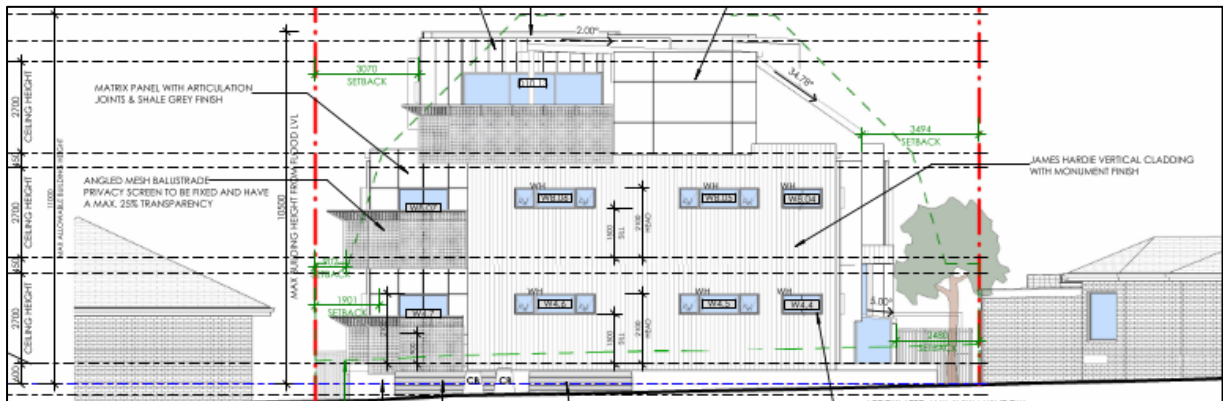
(Above): Northwest elevation showing presentation to the rear adjoining land at 13 and 15 Ferndale Parade. Source: Application documents.
